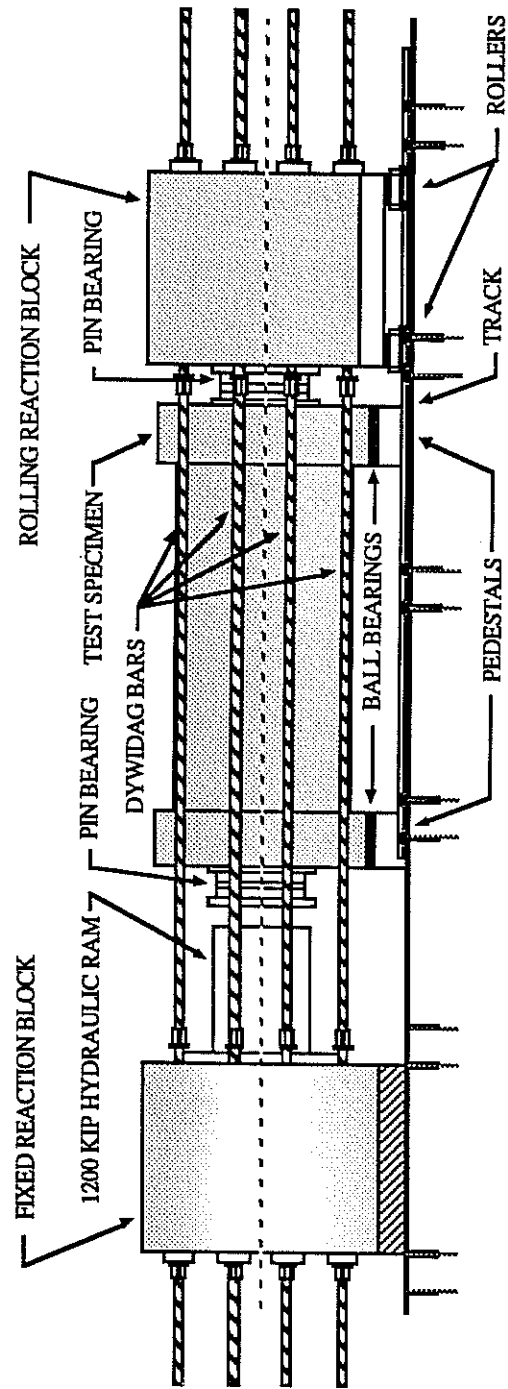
1200 kip Capacity Test Machine, Side View
